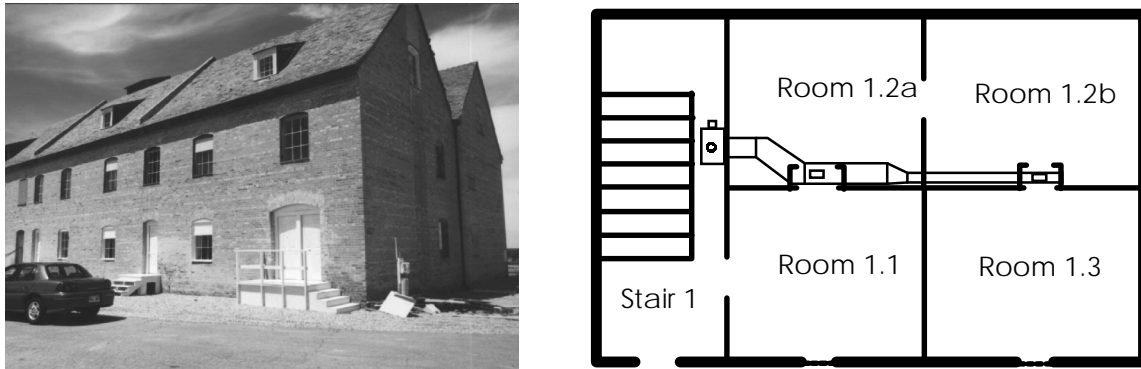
The three-floor building and plan view of the first floor with air handling unit.
